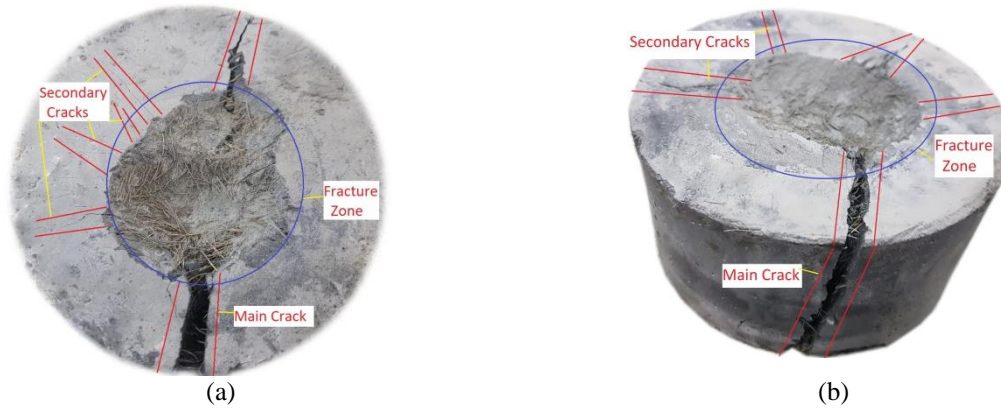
Central fracturing and multi-cracking of steel fiber-reinforced concrete [64]
